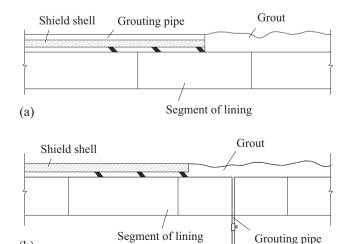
Diagram of grouting in shield tunneling (adapted from [22]): (a) grouting at the tail; (b) grouting at the segment.
